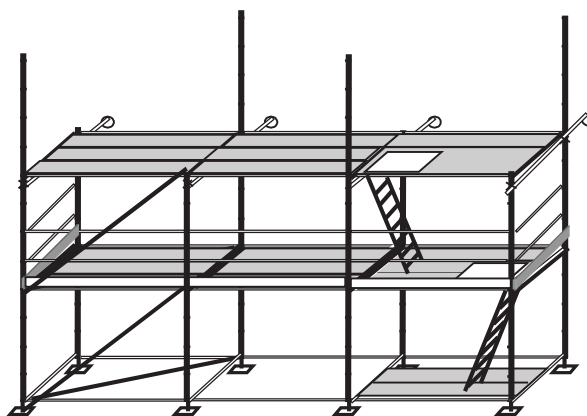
Assembly of the bolts and platforms of the second storey and anchoring of the scaffolding.
